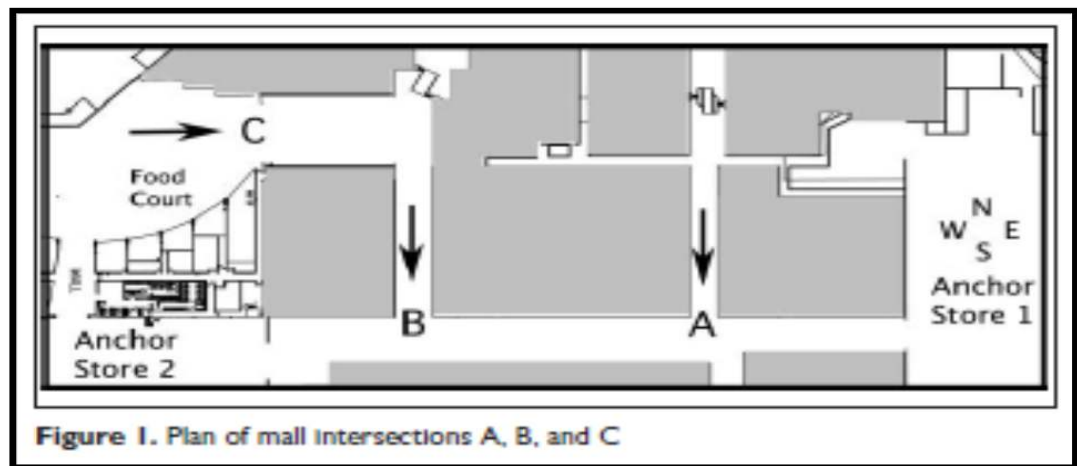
Plan of the Mall Intersections (Spilkova & Hochel, 2009)
